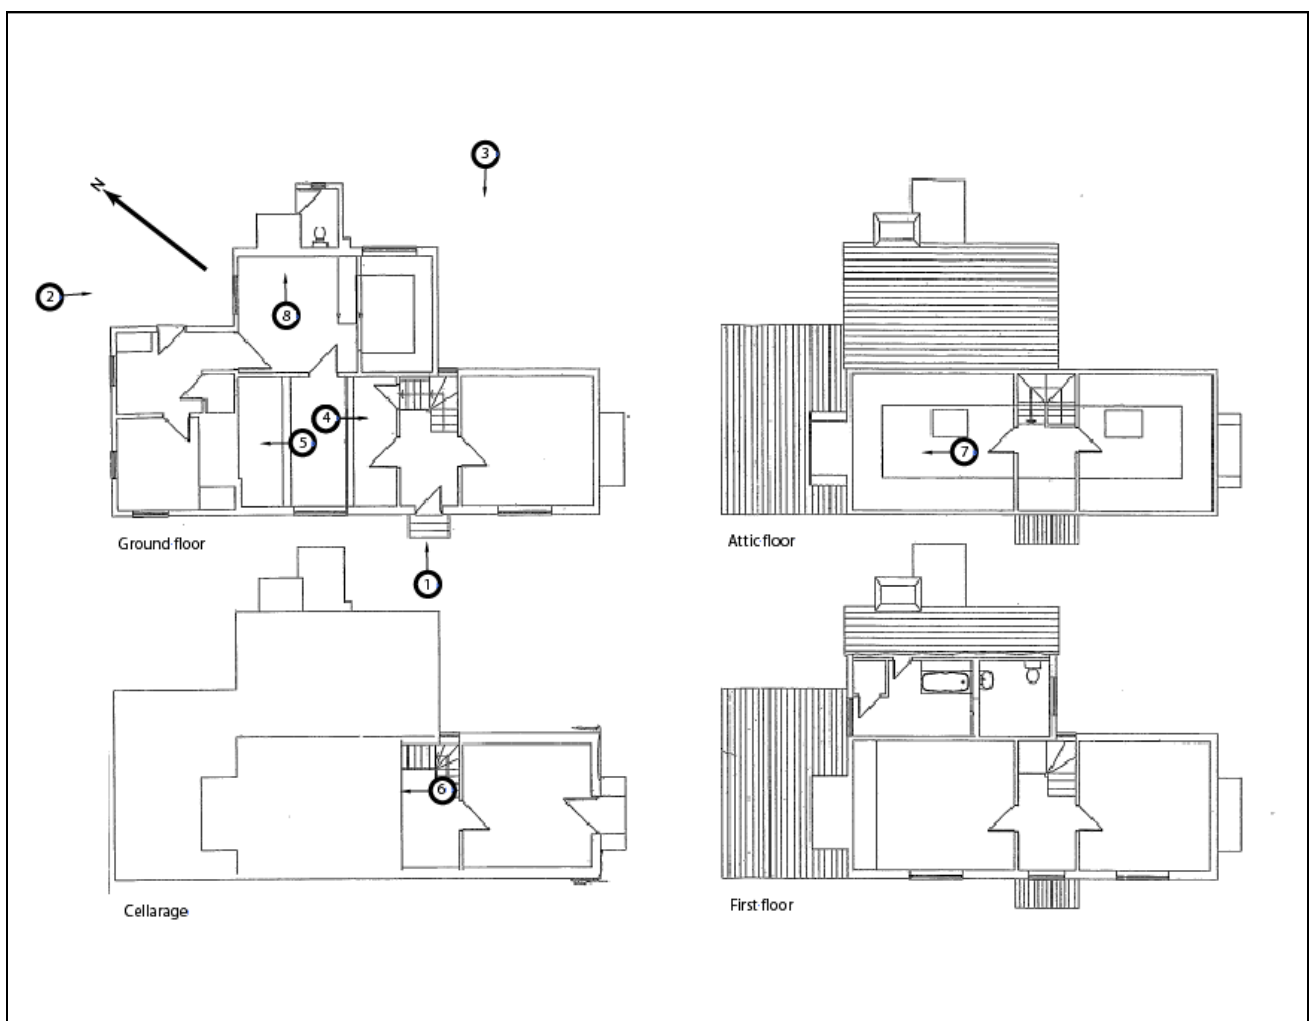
Annotated sketch plan of existing farmhouse at Stretford Bridge Farm (Scale 1:100)
